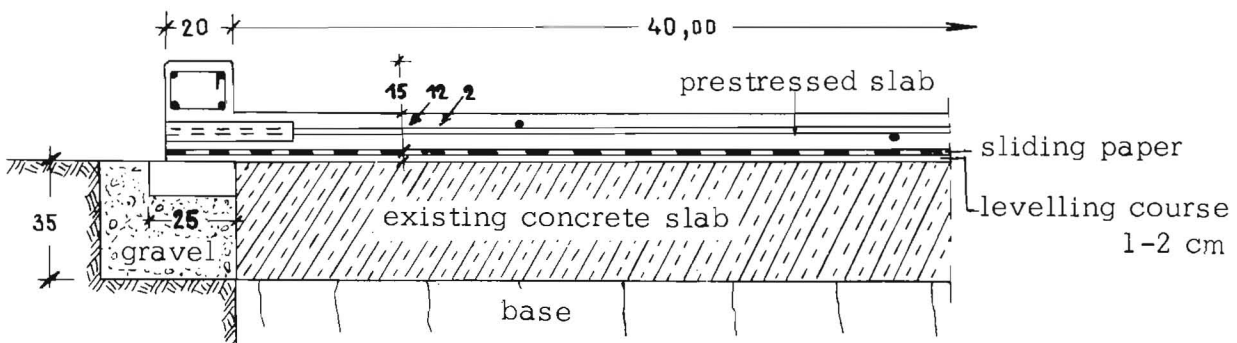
Roller-skating rink at Detmold. Section through slab, showing edge construction.
